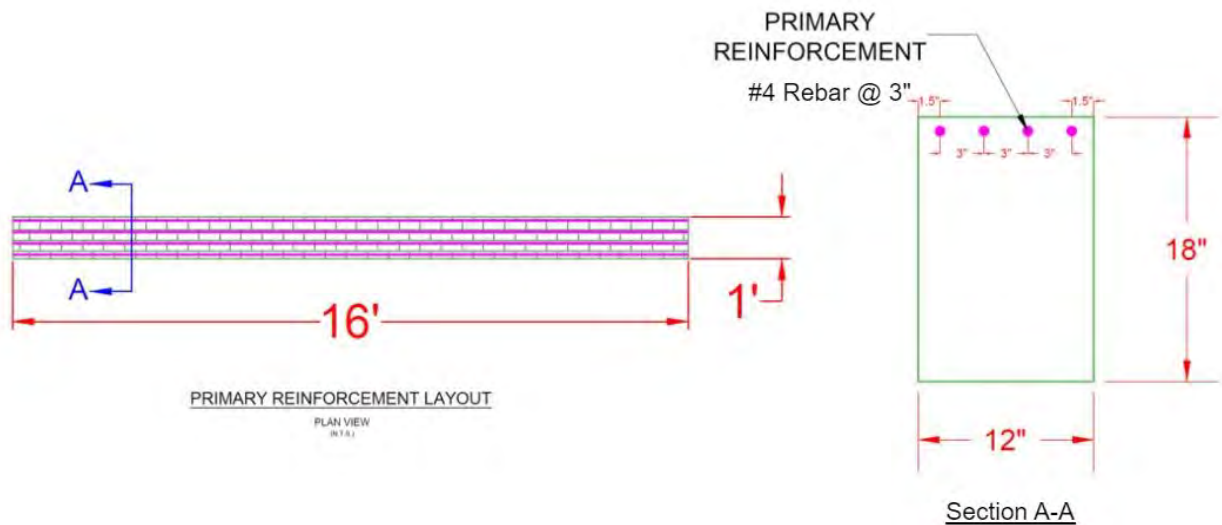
Foundation Design for Concrete Box Culvert.
